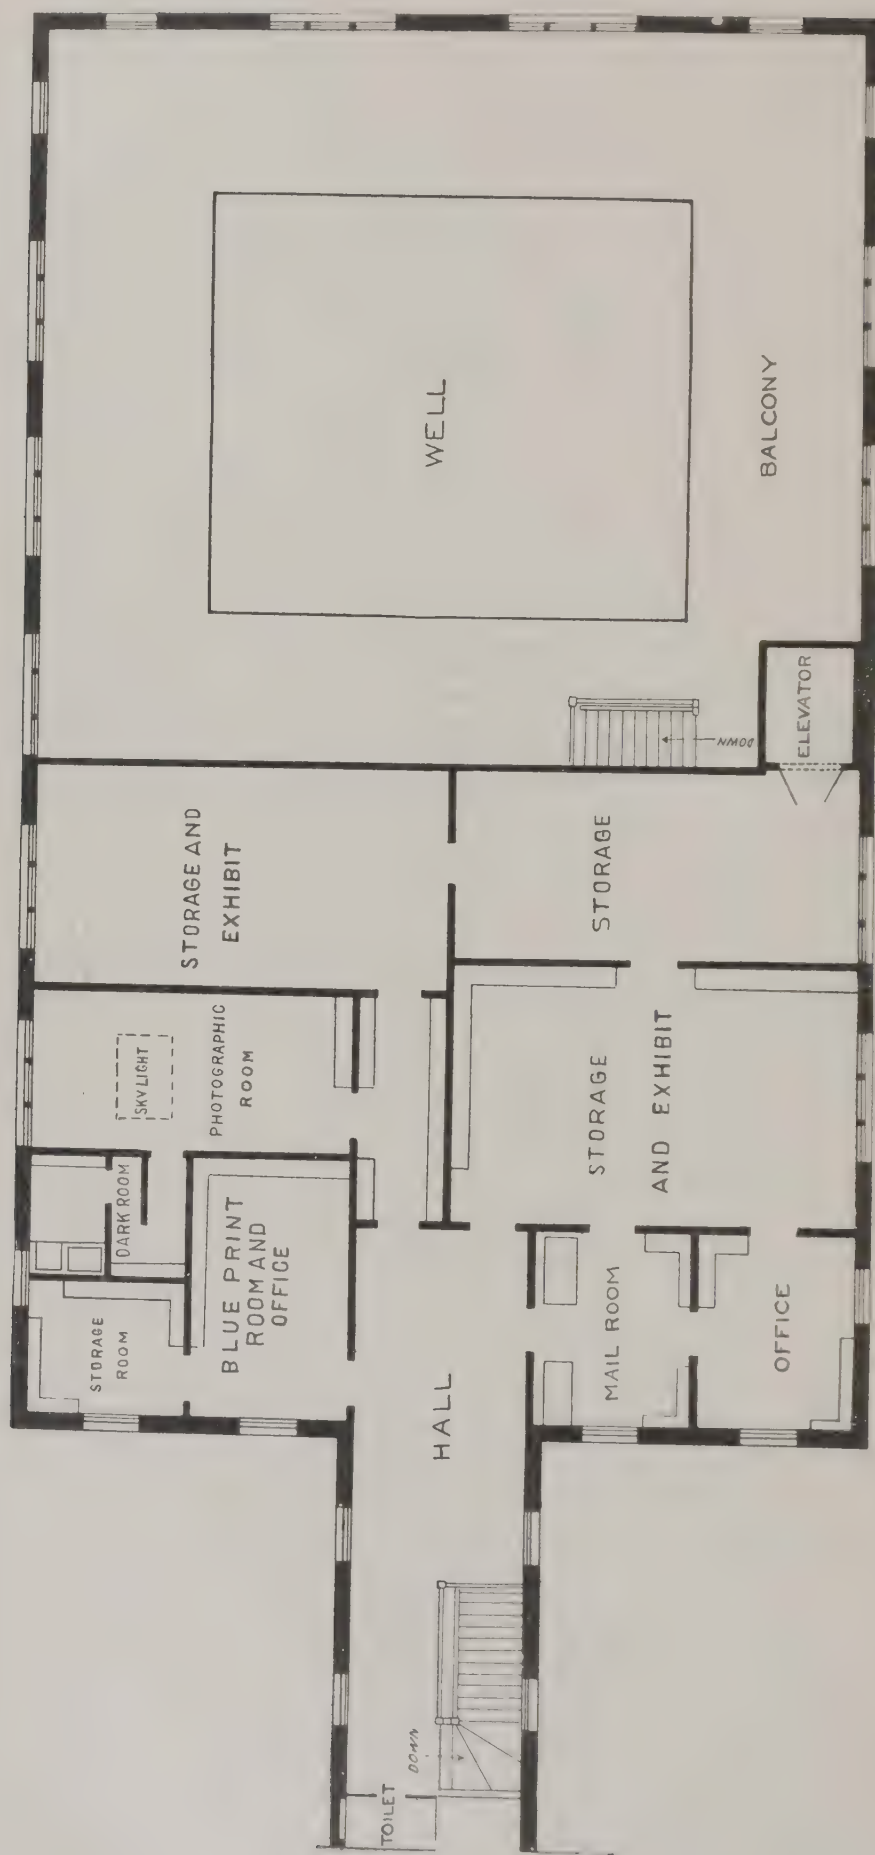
Balcony and third-floor plan of the Farm Mechanics' Building.
